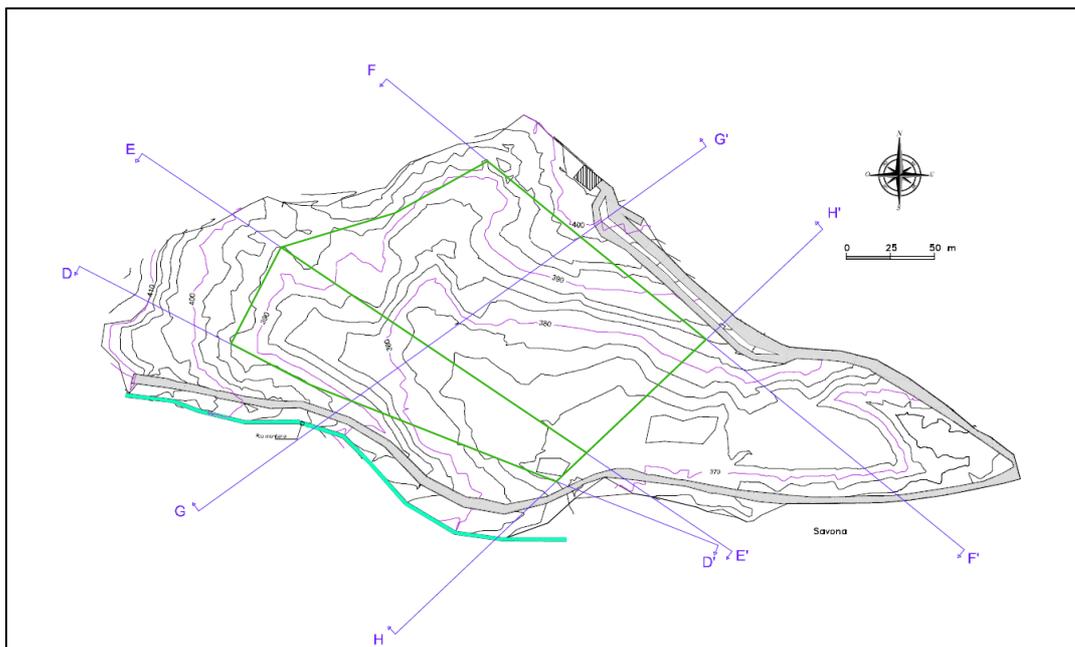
Landfill planimetry (Sciarrone, 2020/2021).
